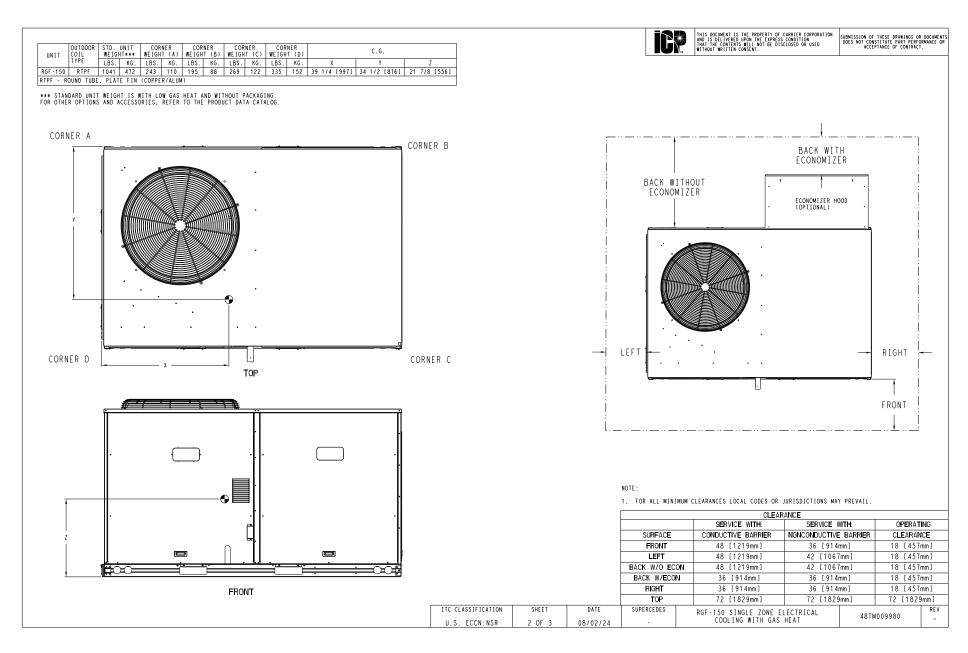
Unit Dimensional Drawing – Size 150 (cont)
